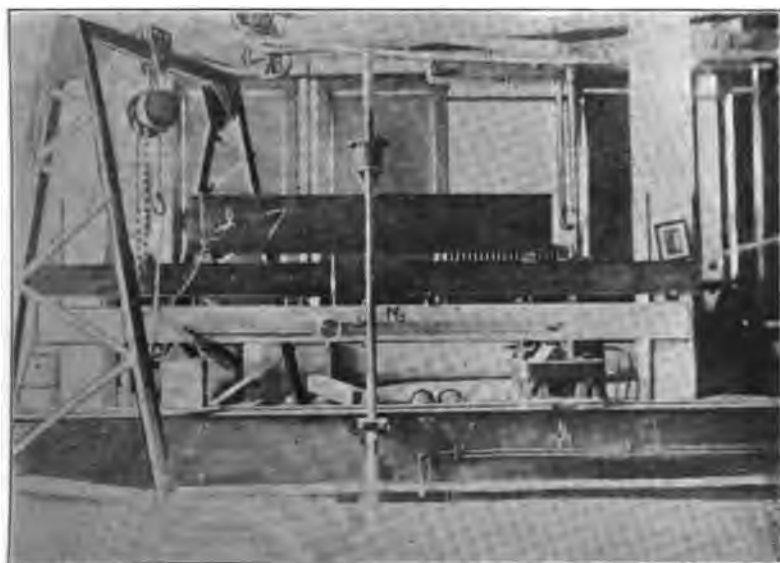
PLATE II.—OVERHANGING BEAM N, READY TO BE TESTED.
